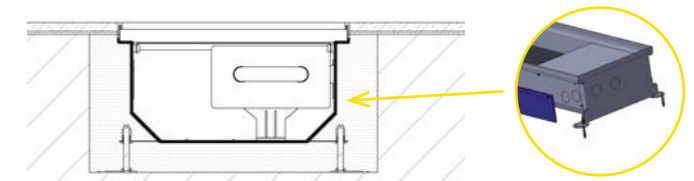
Solid floor - thermal insulation for floor convector without fan to protect the floor on the exchanger side.
